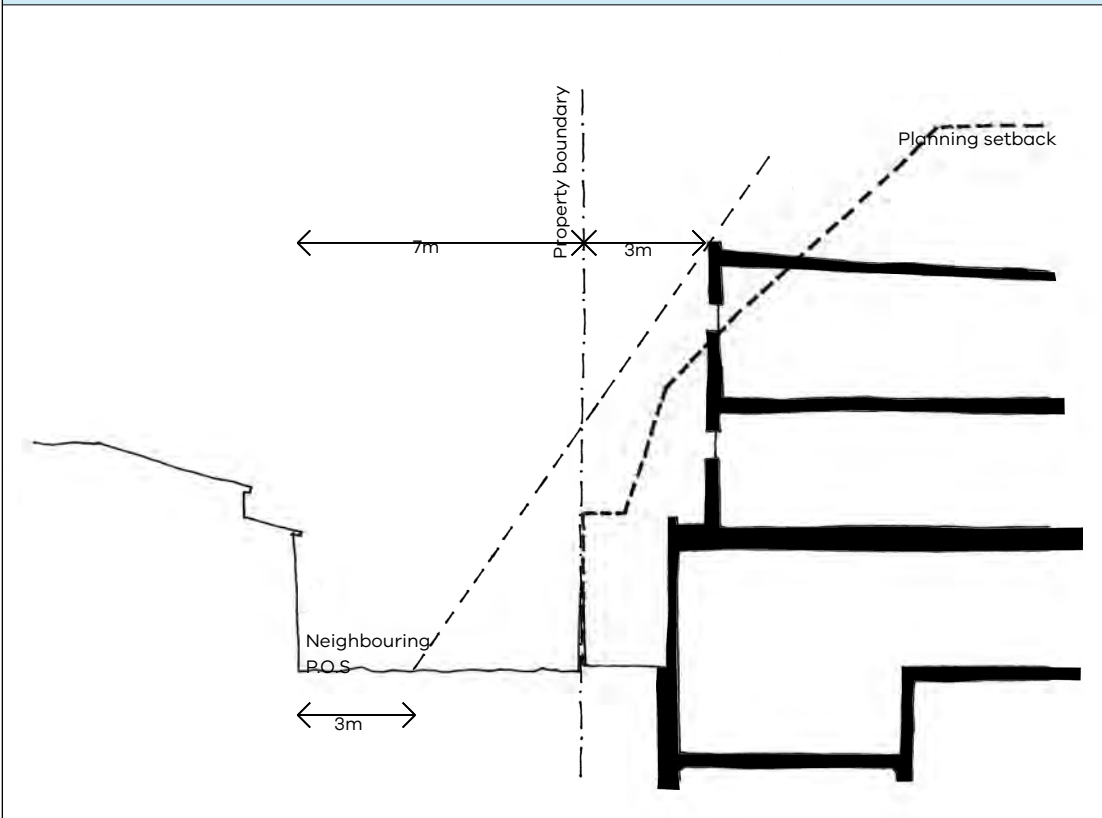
Approach to achieve satisfactory daylight to neighbouring private open space when the proposed building is outside the standard planning setback
